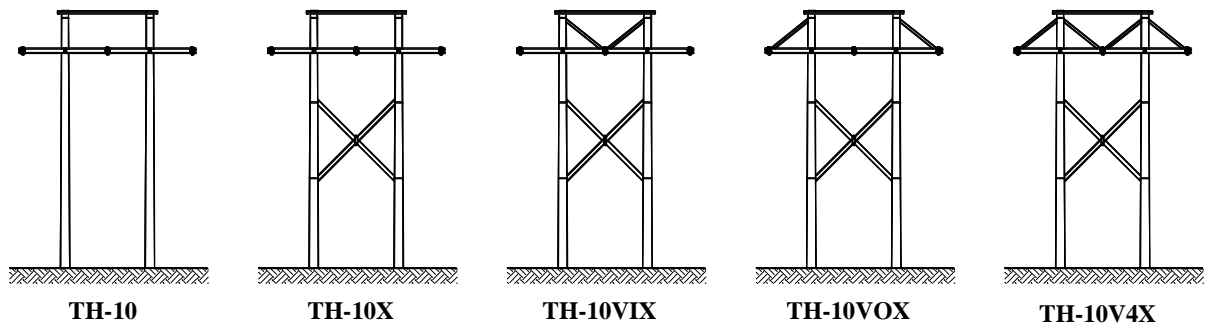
POLE TOP BRACING ARRANGEMENTS
